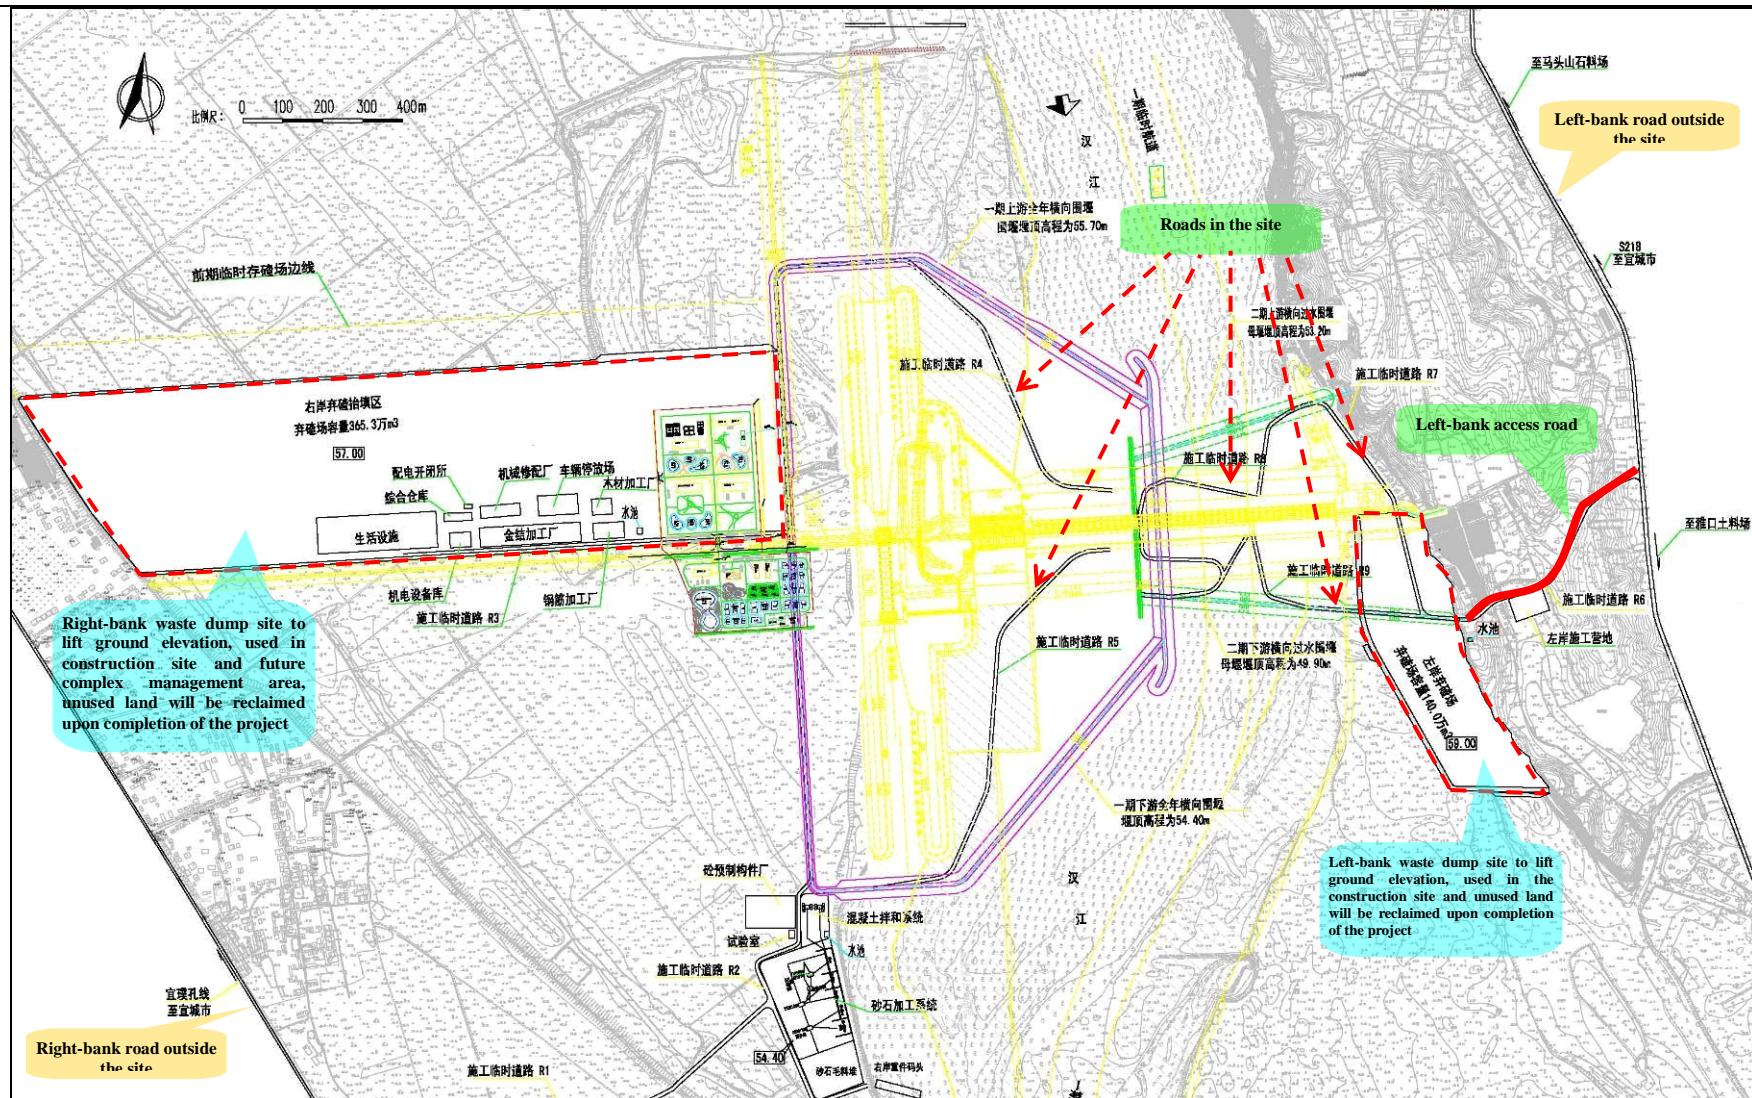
General layout of construction site of Yakou Navigation Complex Project.
